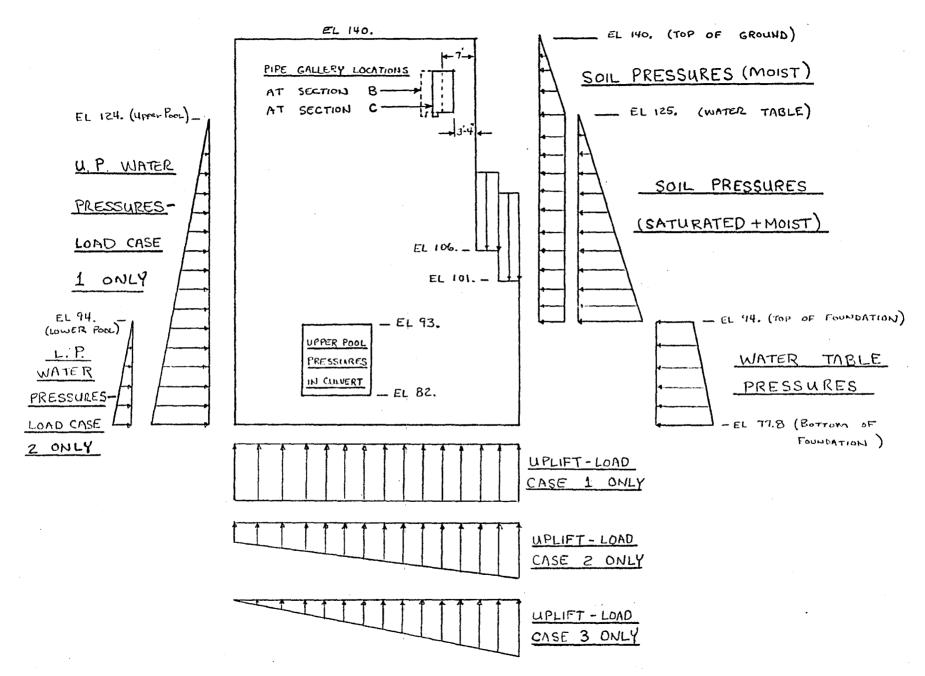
Load Diagrams, Load Cases 1-3, Sections B-B and C-C, Monolith No. 5.
